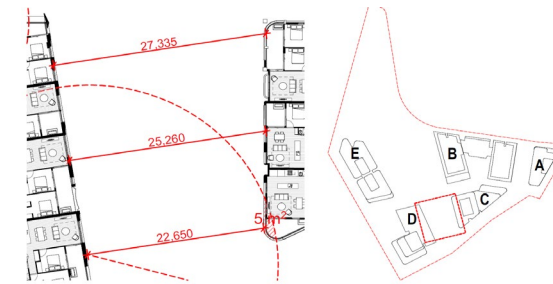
F1.8 Building D-C non compliant separation (Level 08 Only) & Key Plan
